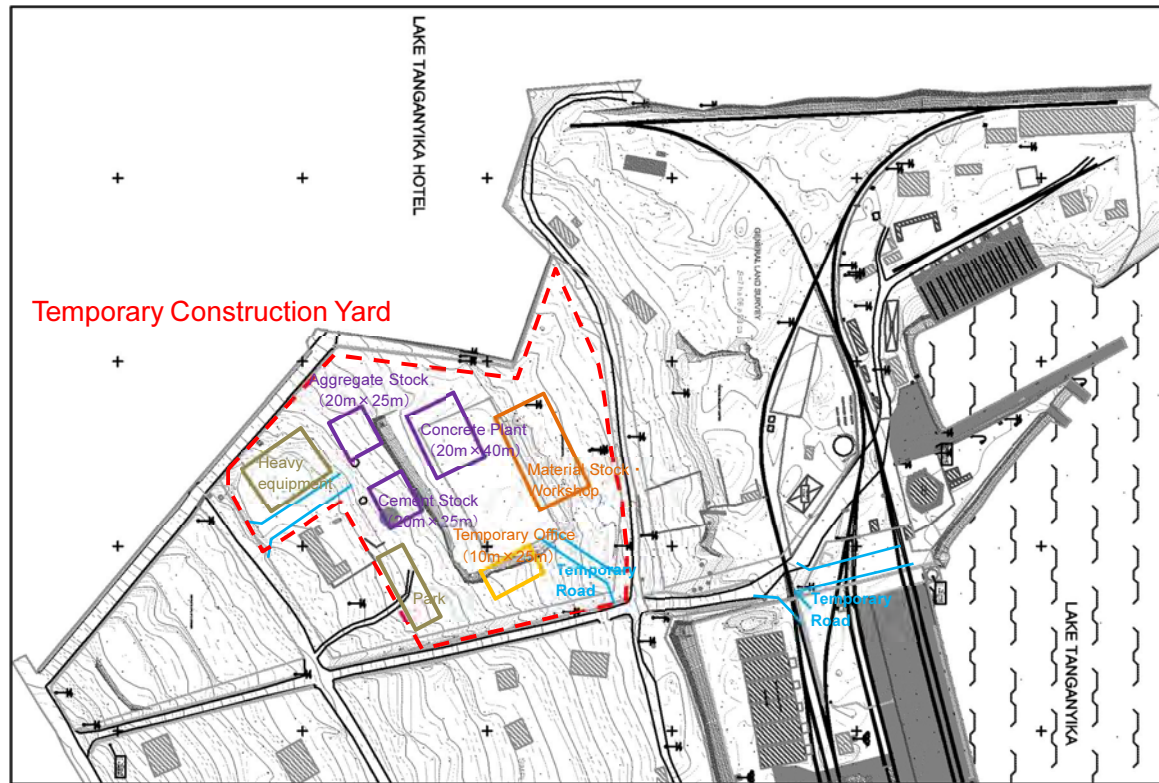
Layout Plan of Temporary Construction Yard and Road
